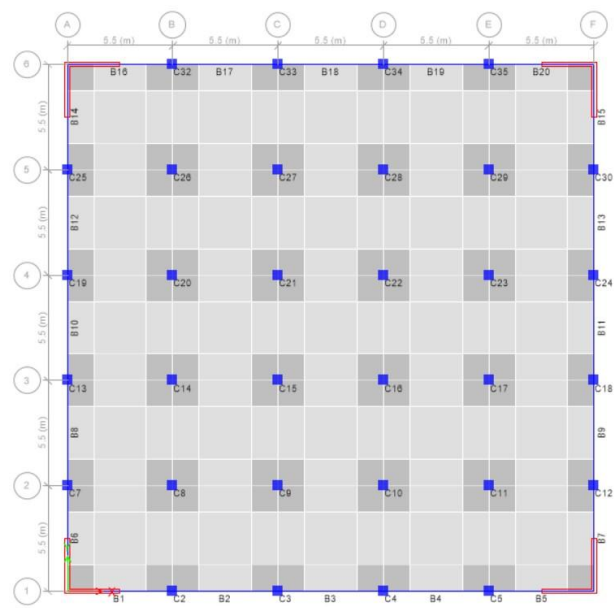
Flat Slab with Drop & Shear wall Building Plan
